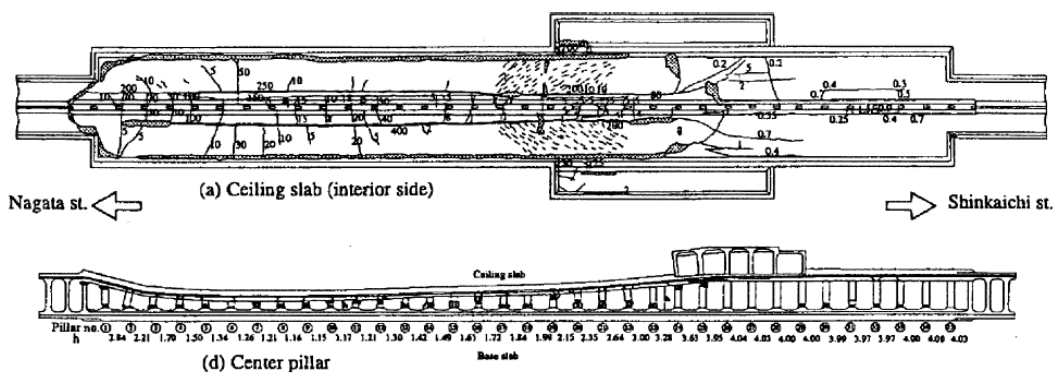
Section sketch of damage to Daikai subway station (Iida et al., 1996).
